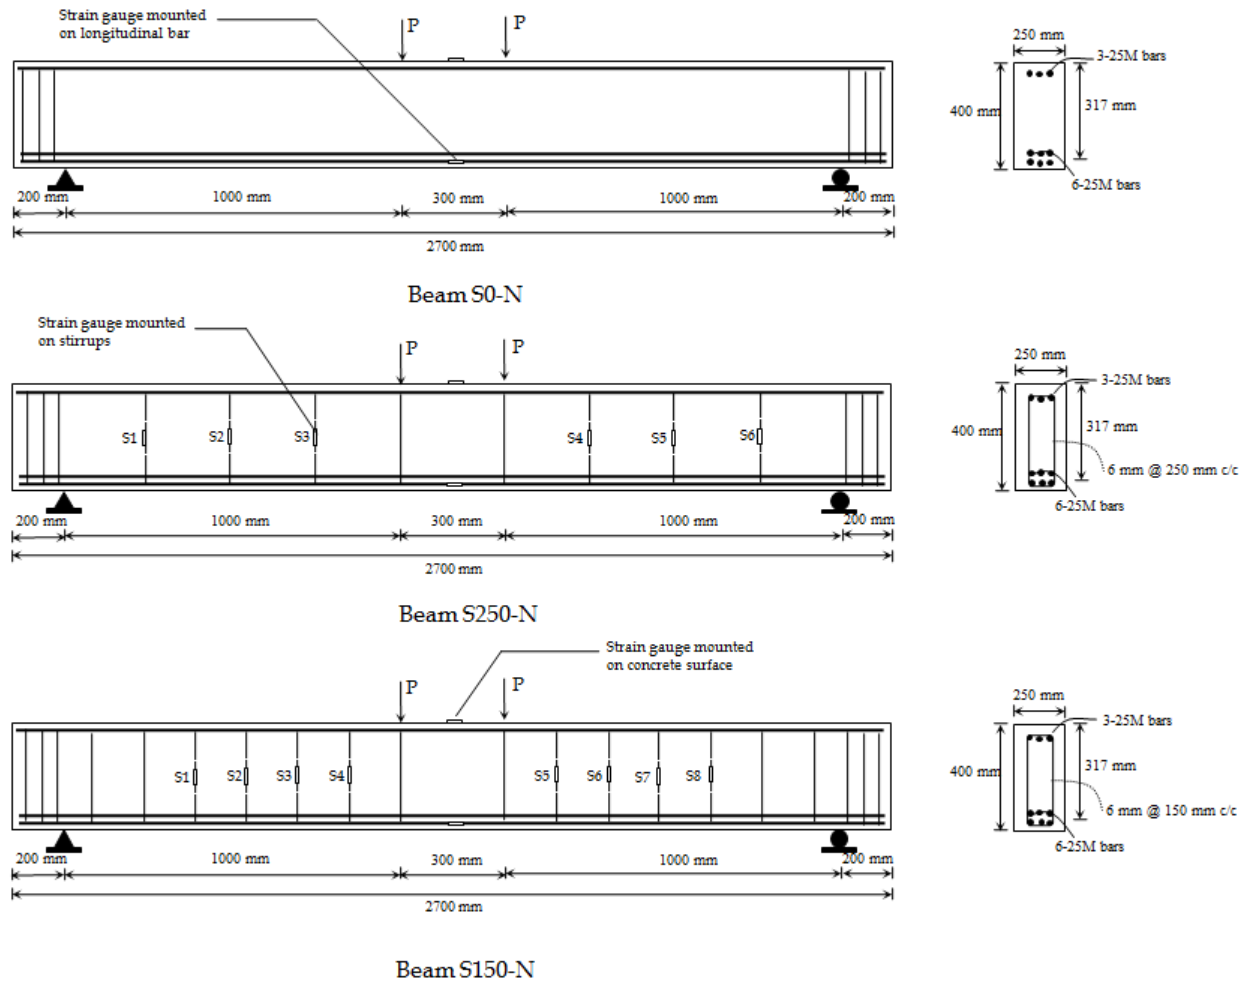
Beam geometry, reinforcement details and layout of strain gauges
